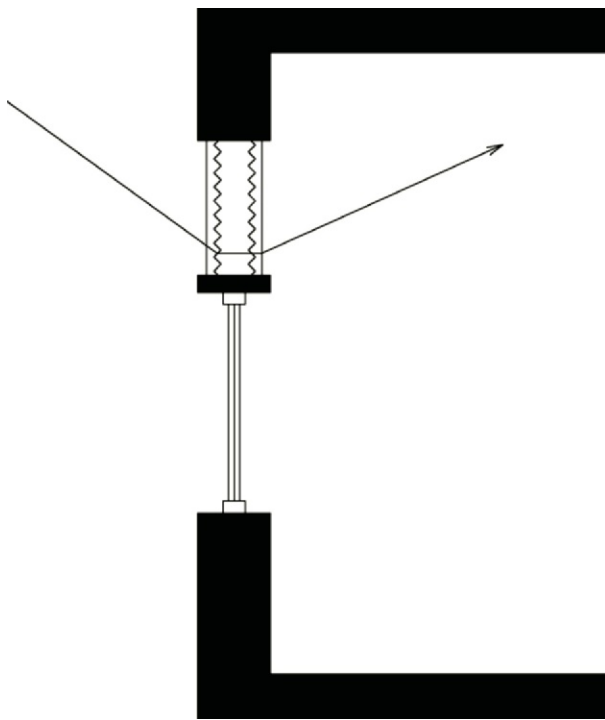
Prismatic glazing tiles refract light farther indoors.
